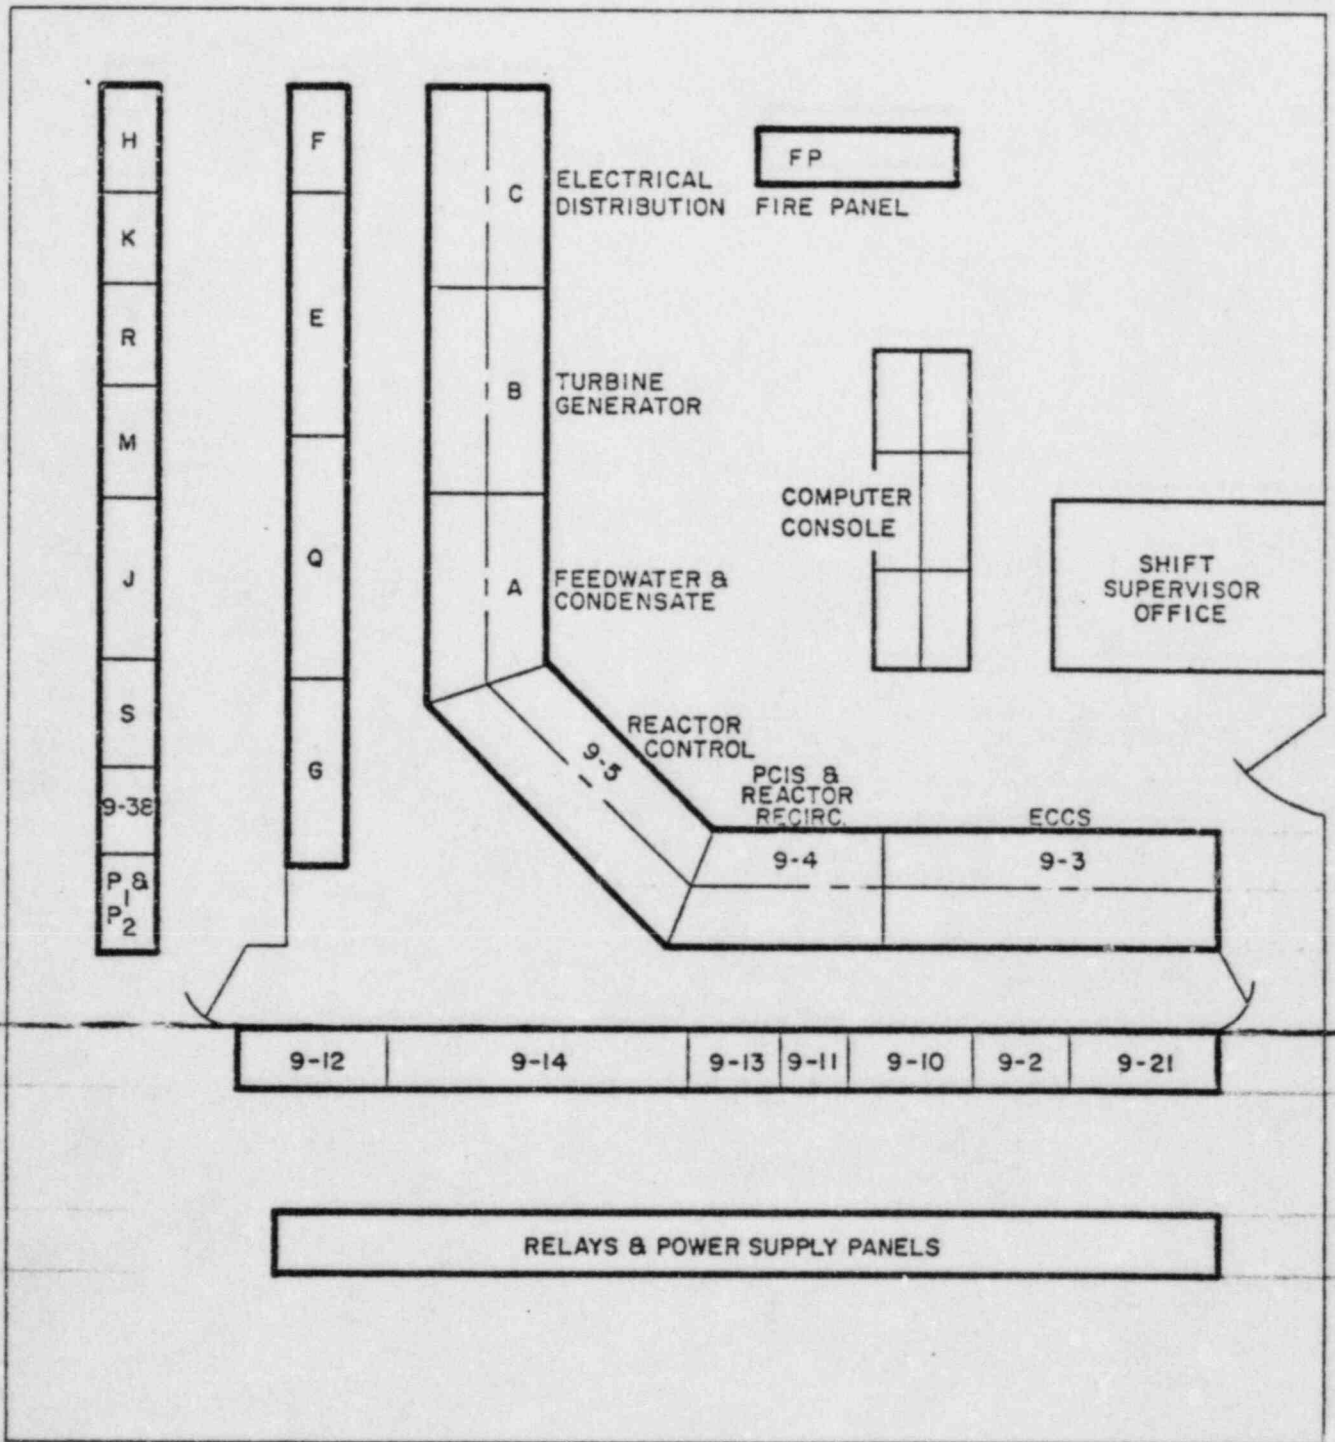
C.N.S. CONTROL ROOM LAYOUT
